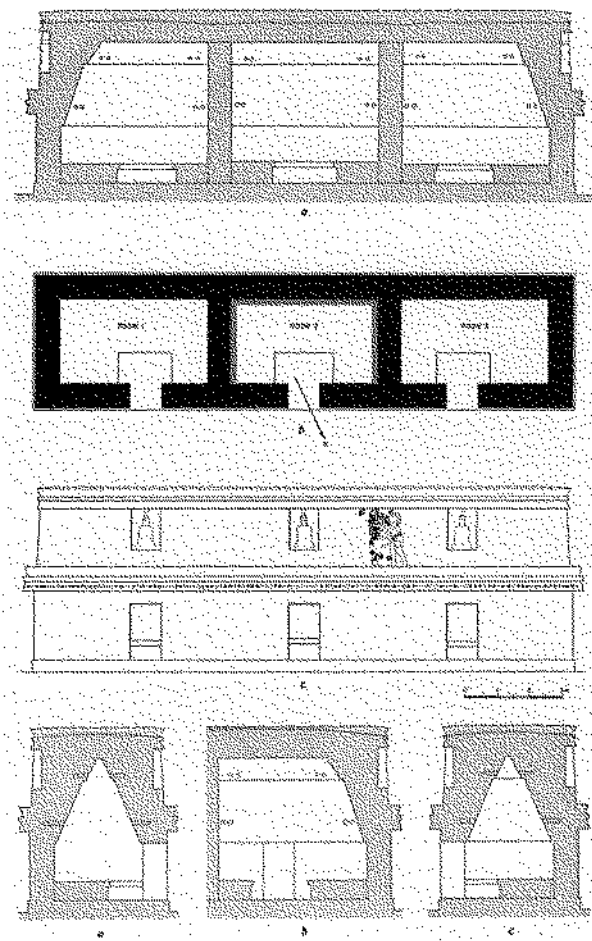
Floor plan, elevation, and cross-section of Structure 1, Bonampak, with location of the battle scene marked. After M. Miller (1986: Fig. 5).
